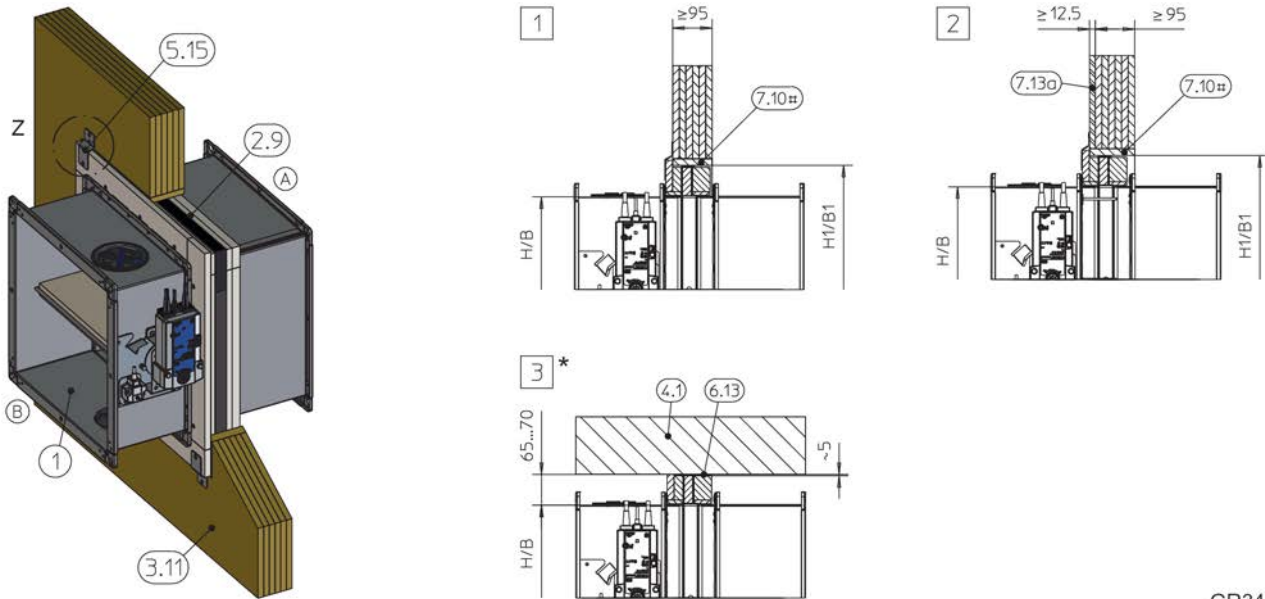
Mortar-based installation into a solid wood wall or CLT wall
